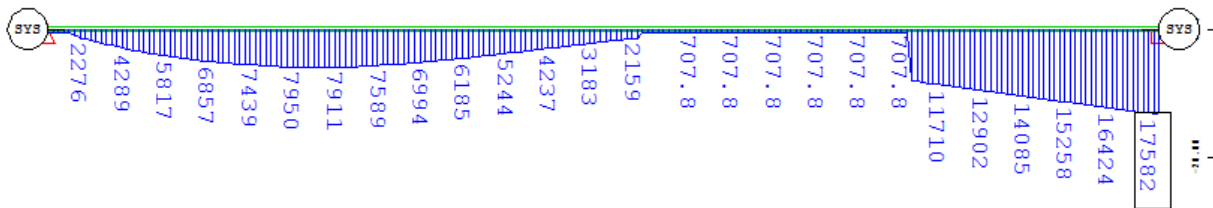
Longitudinal reinforcement for cantilever phase, concrete variant
